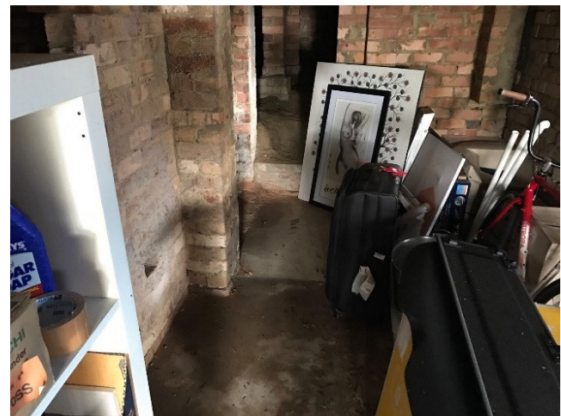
Subfloor storage area showing evidence of water ingress on floor (2017)
